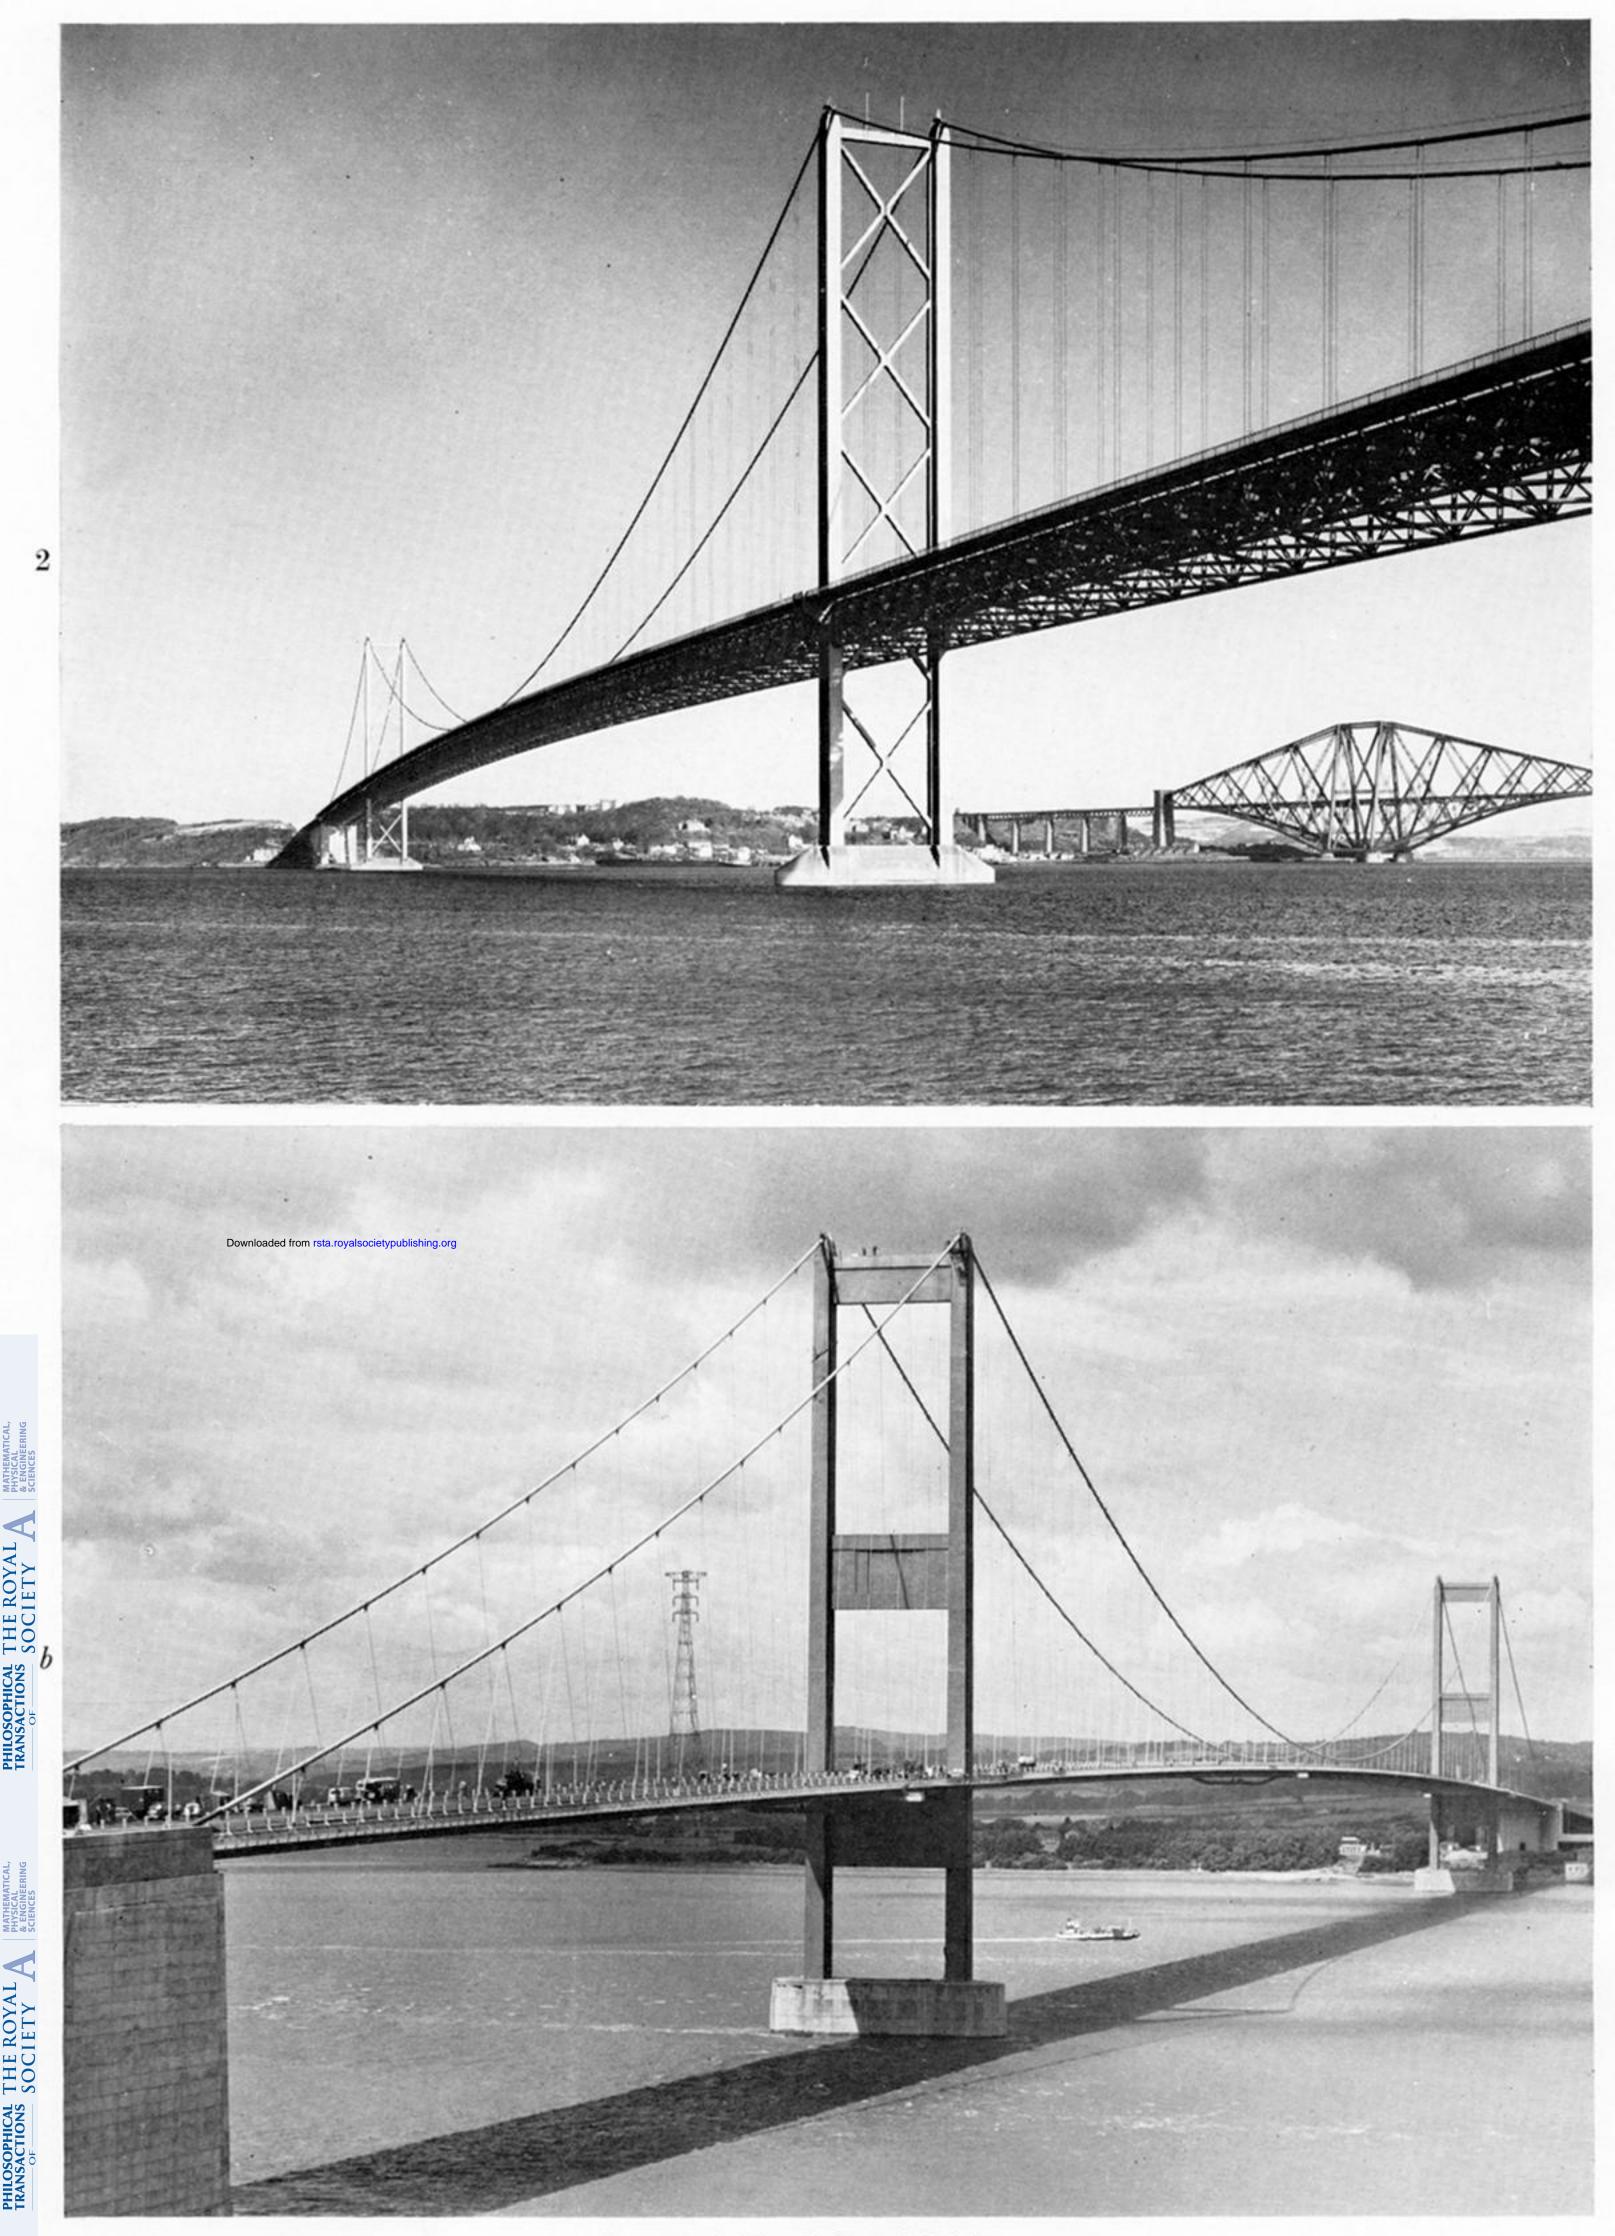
Forth Road Bridge. FIGURE 4*b*. Severn Bridge.
